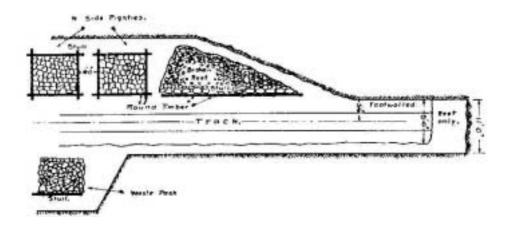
Plan of resuing drive, used at Crown mines (Walton, 1929).
